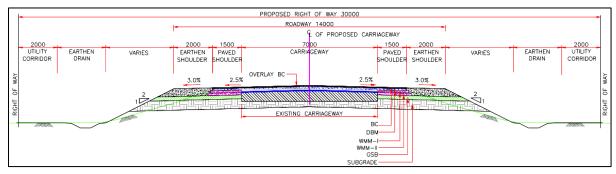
TCS-1 _2-LANE WITH PAVED SHOULDER IN RURAL SECTION
